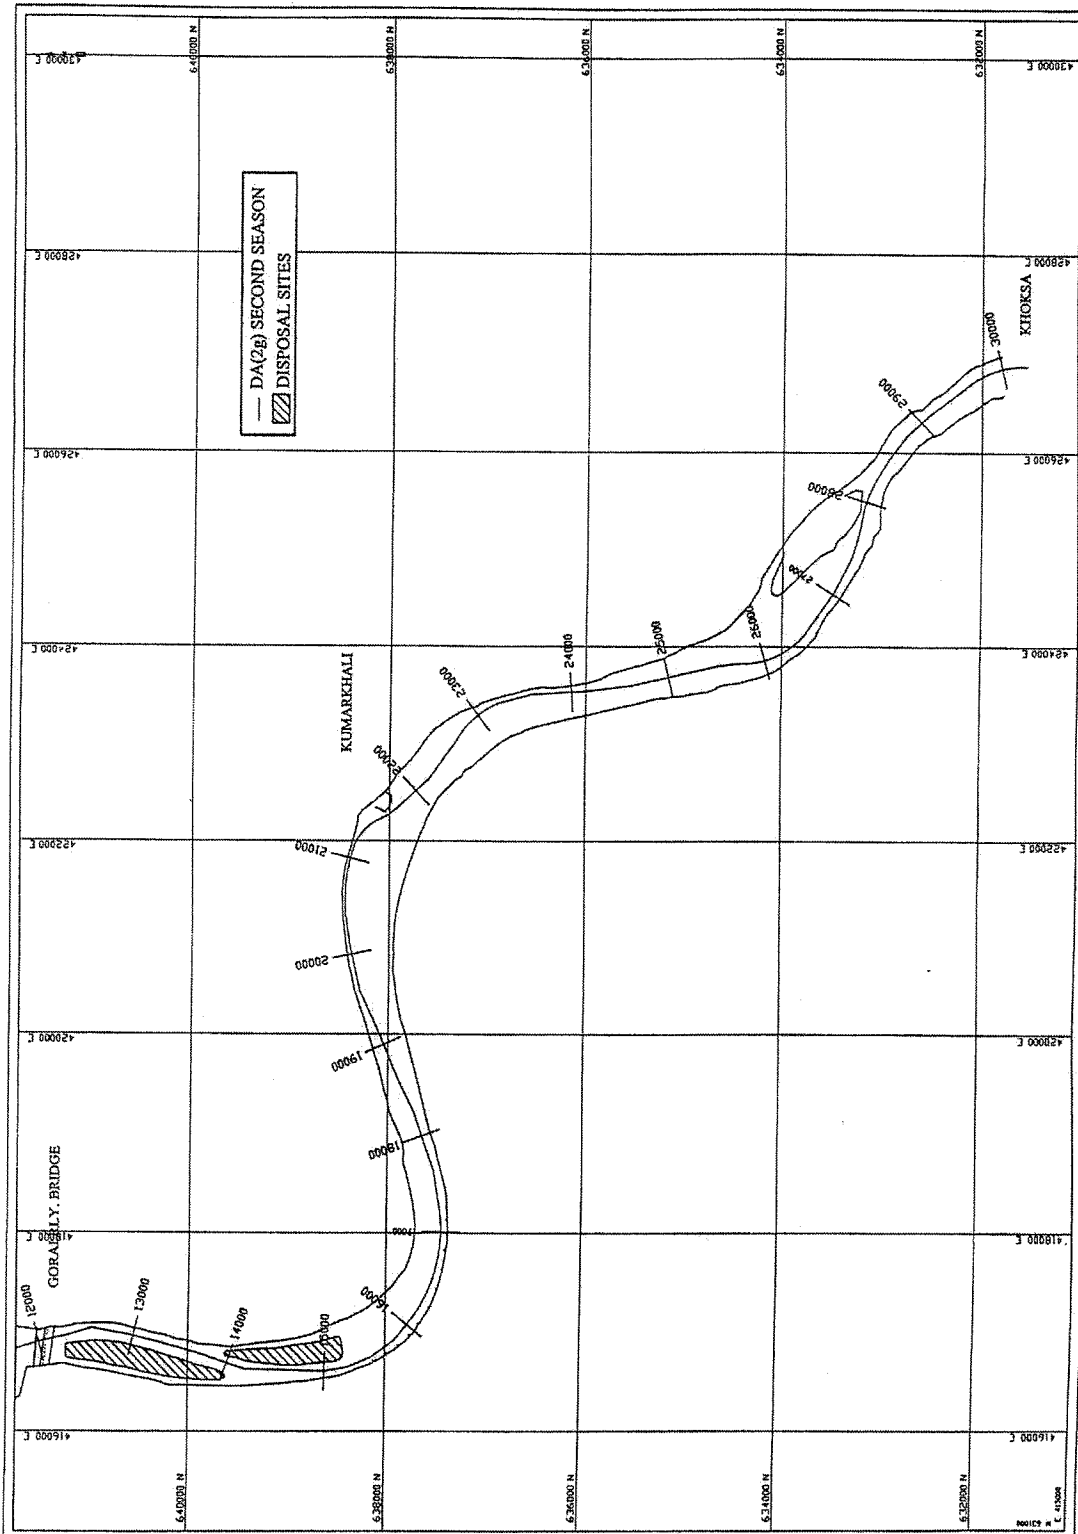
Disposal sites second season, ds Gorai Railway Bridge (GRC, 2000)
